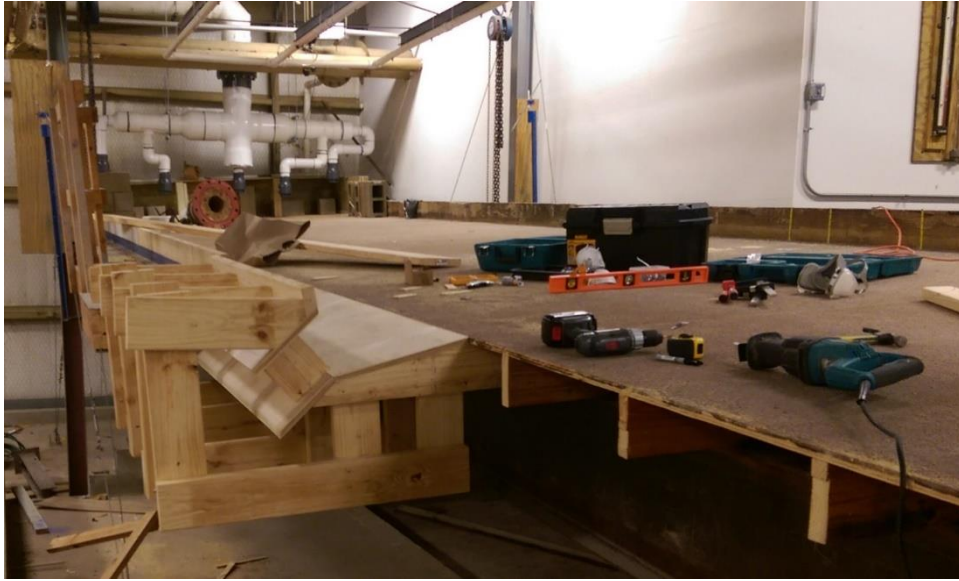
Photo of the side of the 2x6 inch beams and $\frac{3}{4}$ inch plywood used to construct the TxDOT curb inlet.
